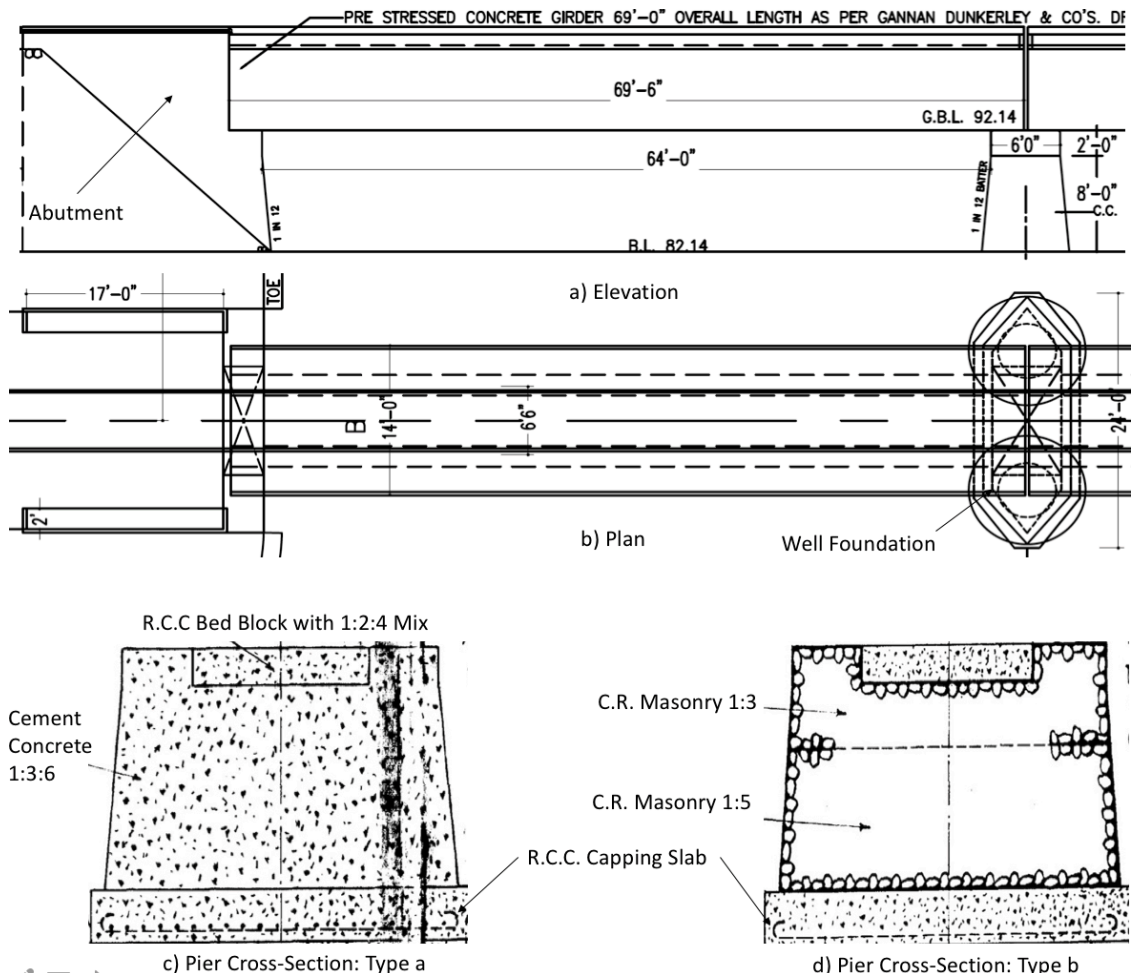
Railway Bridge a) Elevation b) Plan c) Pier Cross Section: Type a, and d) Pier Cross-Section Type b (Source: Ministry of Southern Railways Bridge Drawings Record, India)
